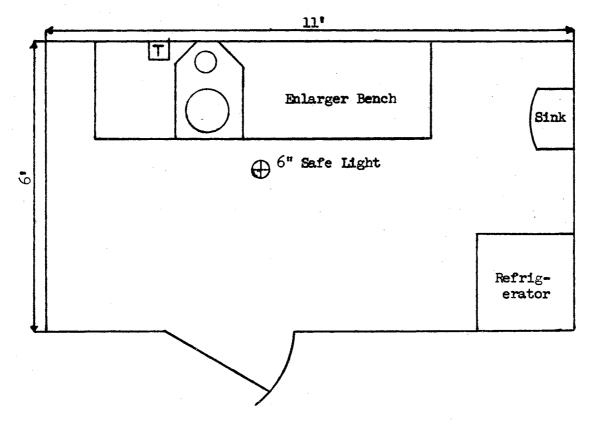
DARKROOM FLOOR PLAN - HOLDENVILLE DAILY NEWS. (SCALE 1/2" = 1')
